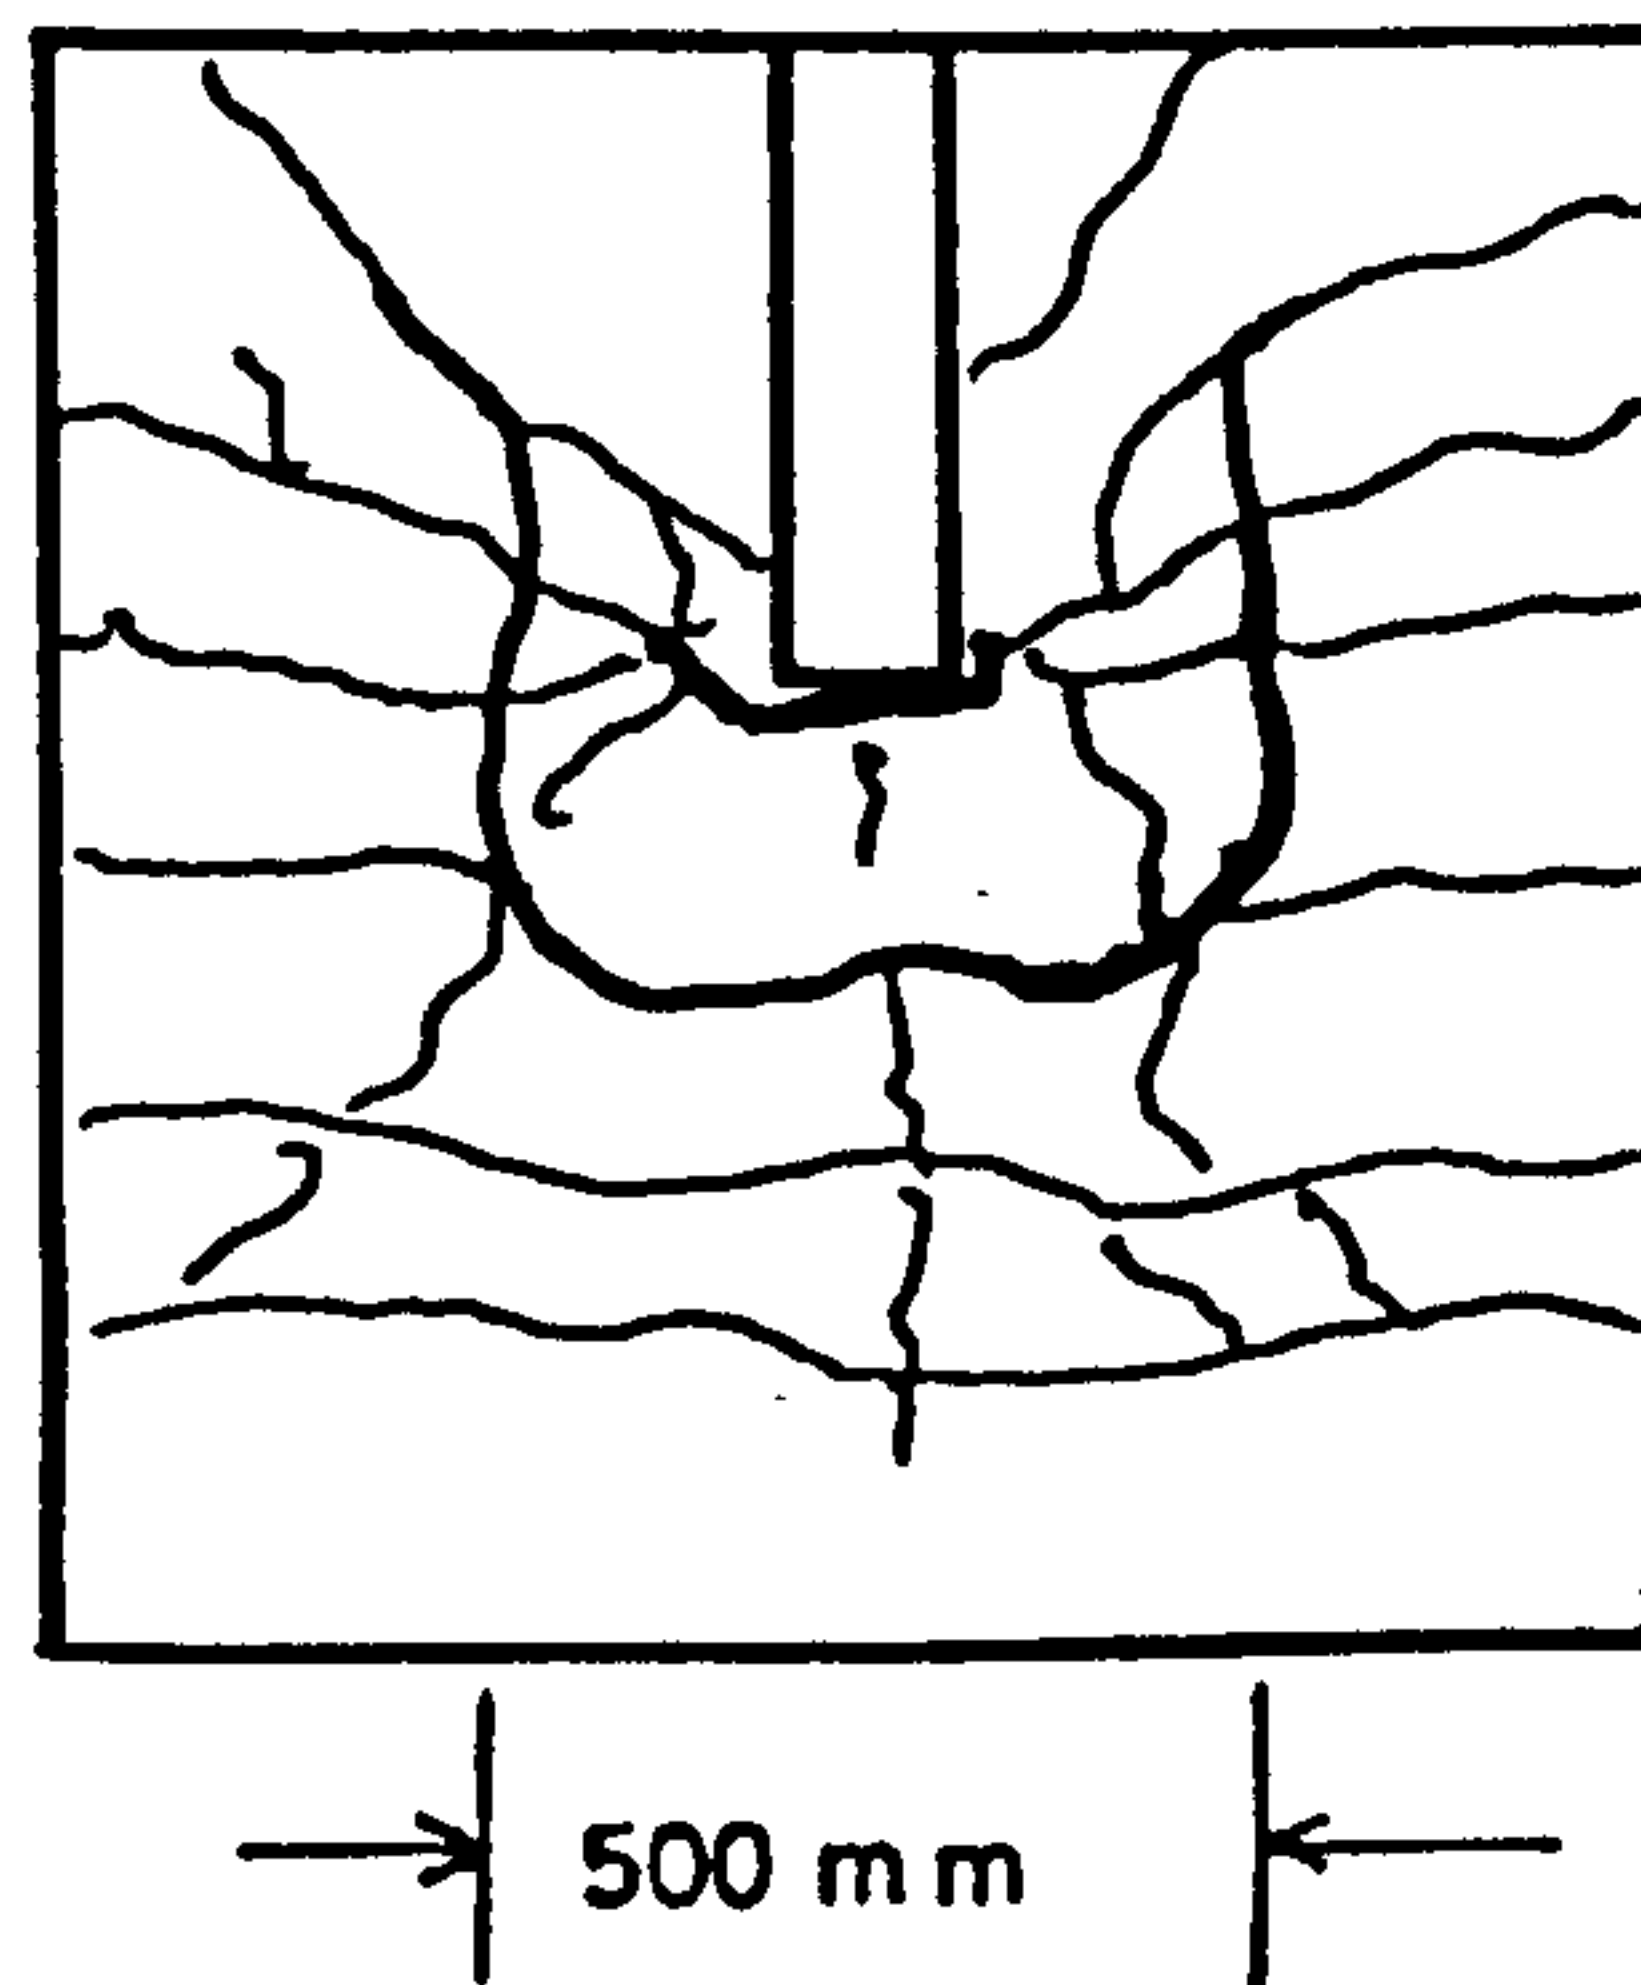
Crack pattern of slab of model PT1 after failure.
